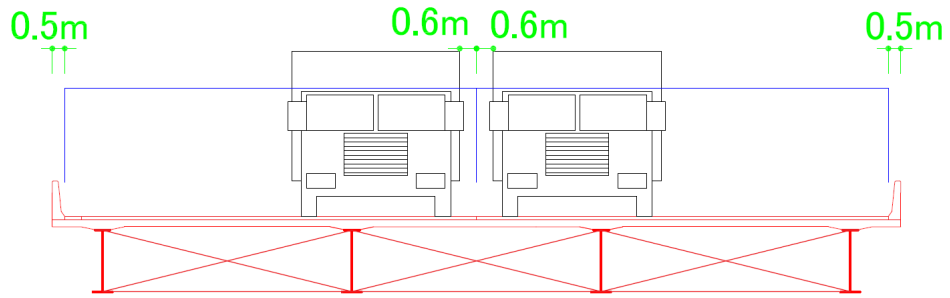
Live loading case for one-lane bridge for ULS and SLS for exterior and interior girder-partial load
